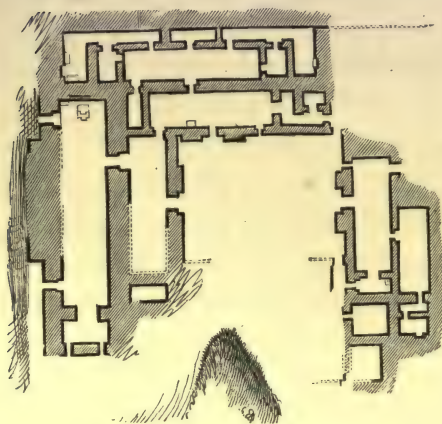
Ground-plan of the North-west Palace of Nimrud.
